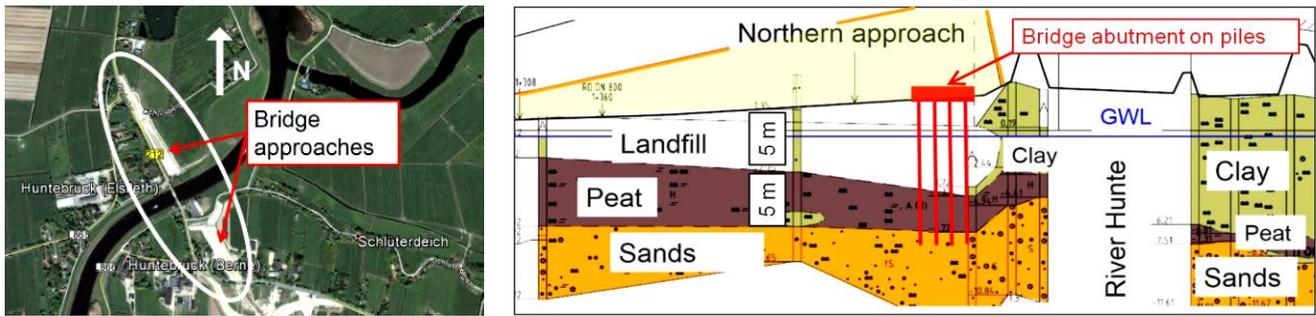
Berne bypass: Overview of crossing the river Hunte (left) and simplified longitudinal cross section (right); GWL=average ground water level
